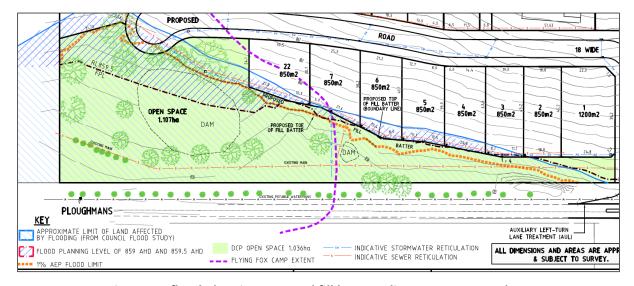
flood planning area and fill batter adjacent Lots 2-7 and 22
